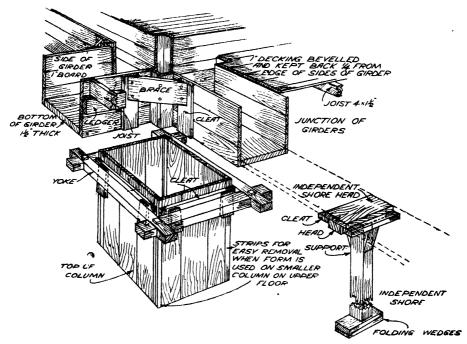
Forms for Junction of GIRDERS AT B IN FIG. 1
